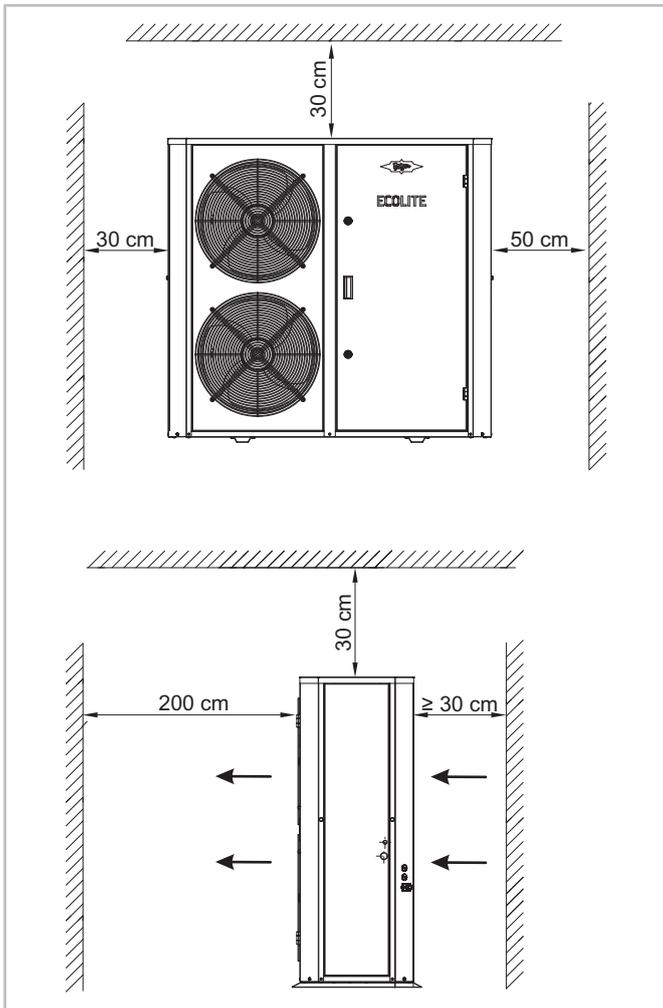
Minimum distances to the wall and ceiling (example shows LHL5E/ ..)
